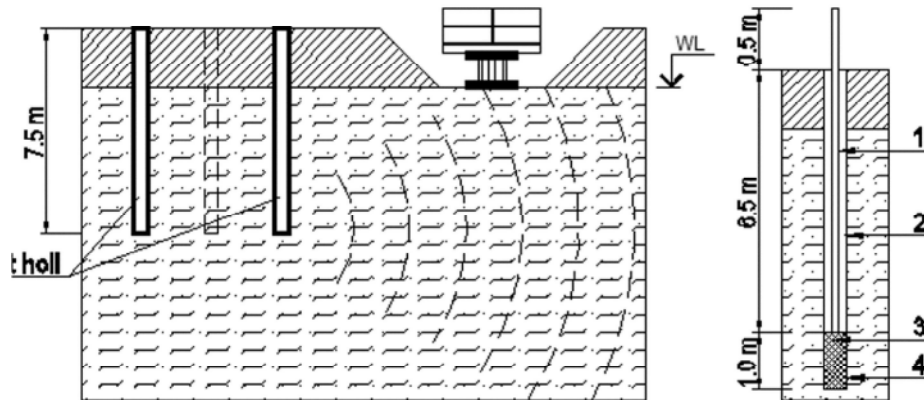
Cross-section of the experimental site and the layout scheme of the explosion column: 1 is the tube $d = 50 \text{ mm}$; 2 is the drilled well $d = 220 \text{ mm}$; 3 is the explosive charge; 4 is the tube $d = 200 \text{ mm}$
